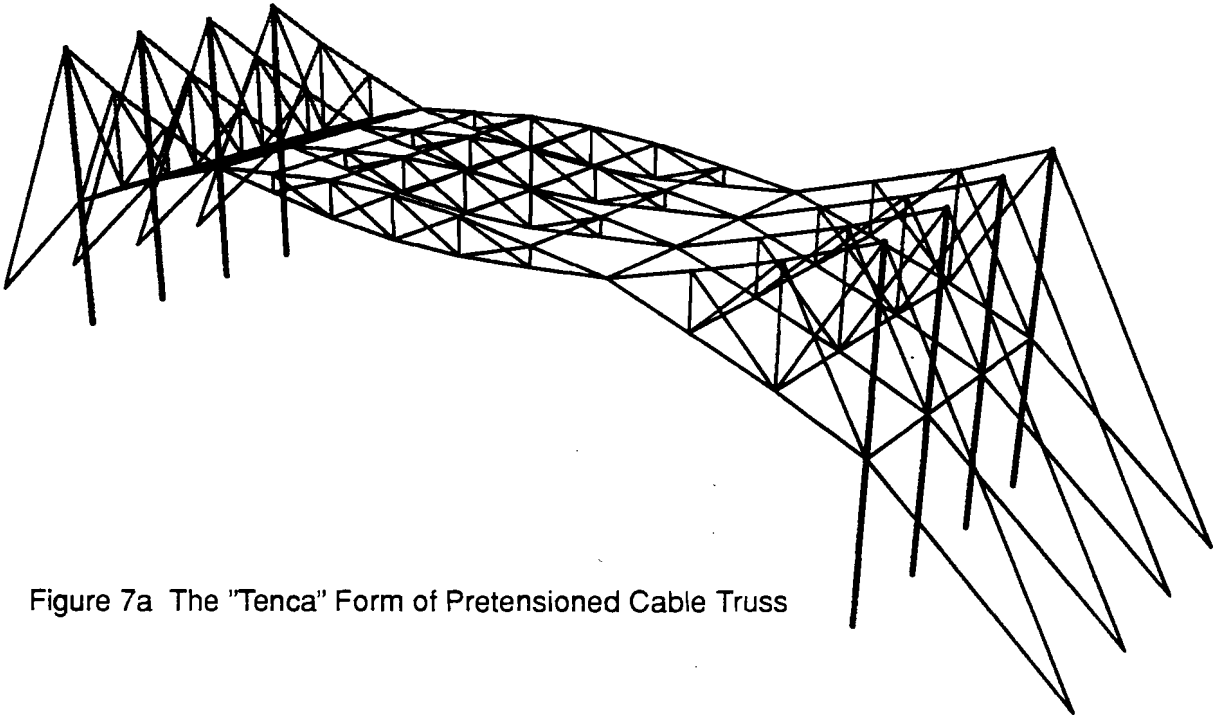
The "Tenca" Form of Pretensioned Cable Truss
